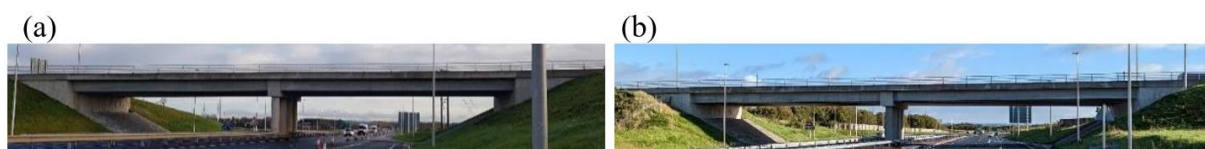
photos of beam and slab bridges, (a) B&S 1, (b) B&S 2.
